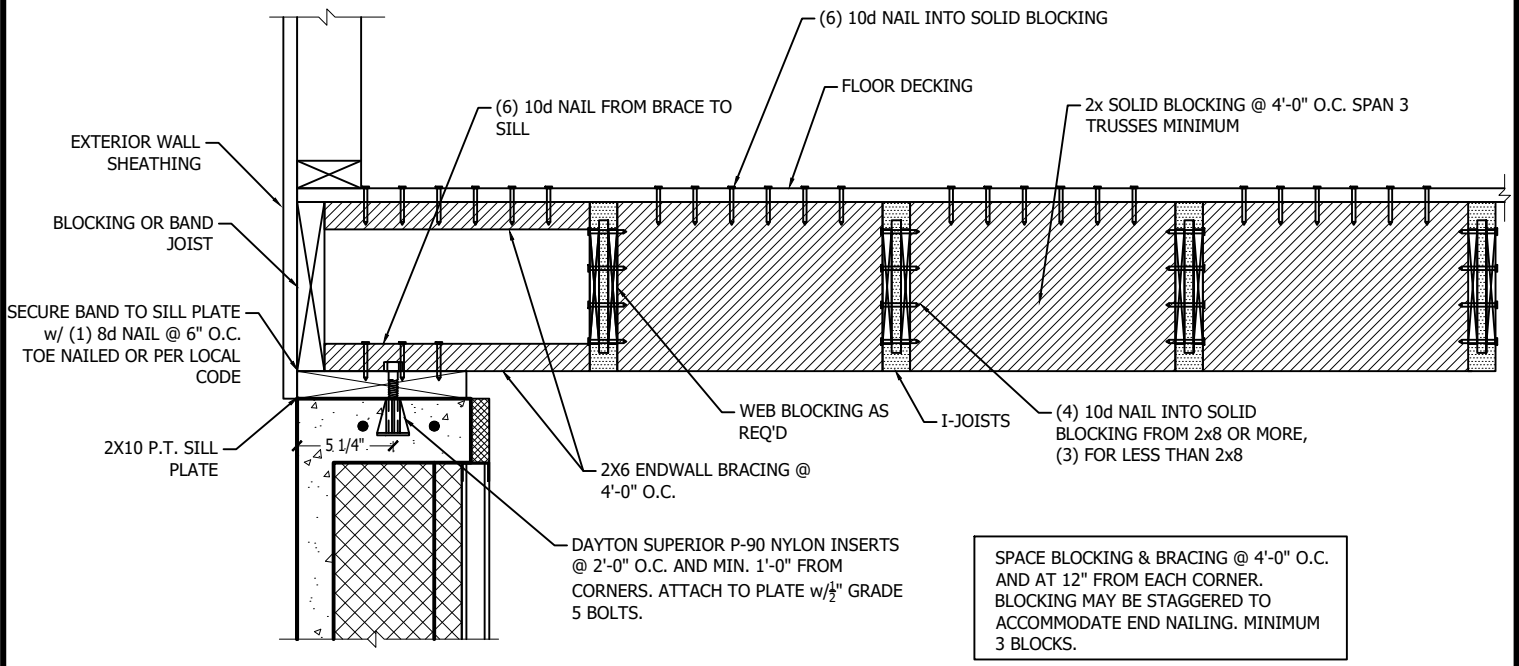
I-JOISTS PARALLEL TO WALL
